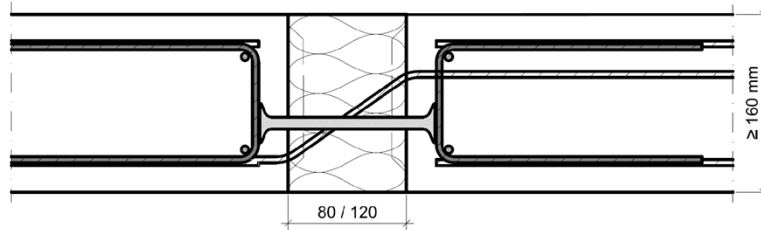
Example of Schöck Isokorb® Type Q with SCE (or CCE) with shear force bar with straight bar ends
